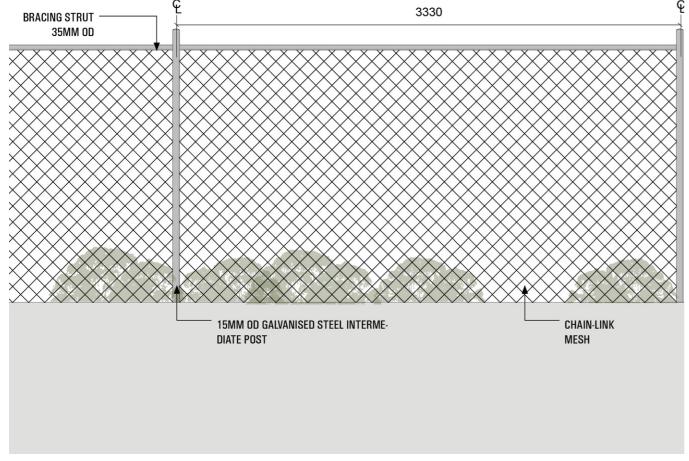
Indicative elevation: Type 1 Perimeter / Security Fencing Scale 1:25 @A3
